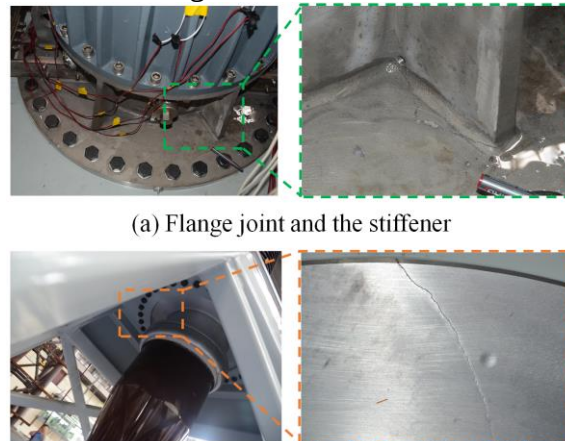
Damage to the transformer bushing in the shaking table tests
